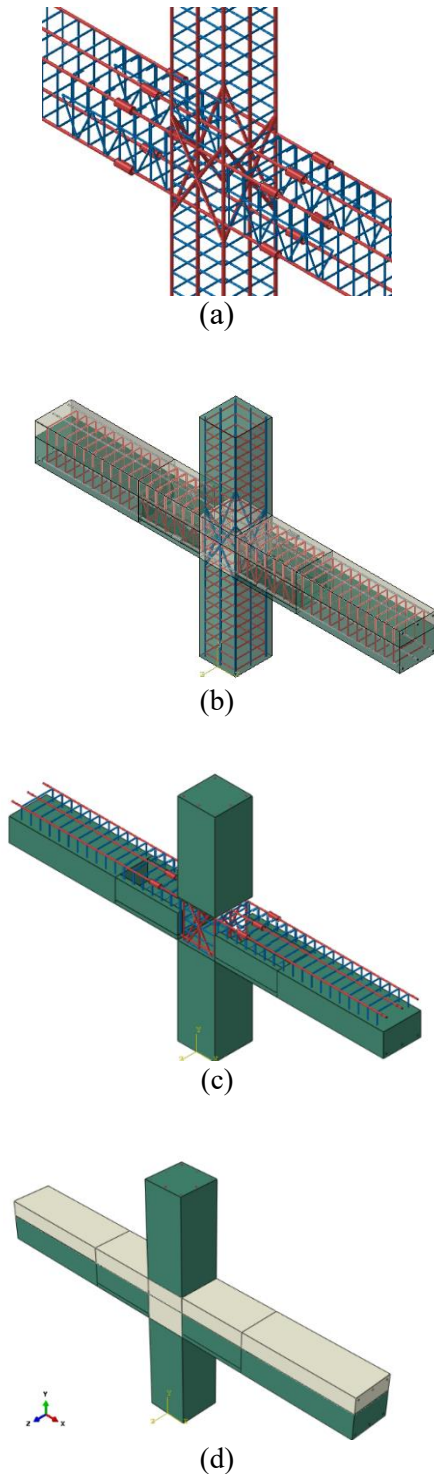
The 3D model of B C-3; a) Couplers and diagonal reinforcement of the column b) Reinforcement arrangement in the dry (precast) and wet (cast in place) parts c) Dry (precast parts) d) Complete dry (precast) and wet (cast in place) parts.
